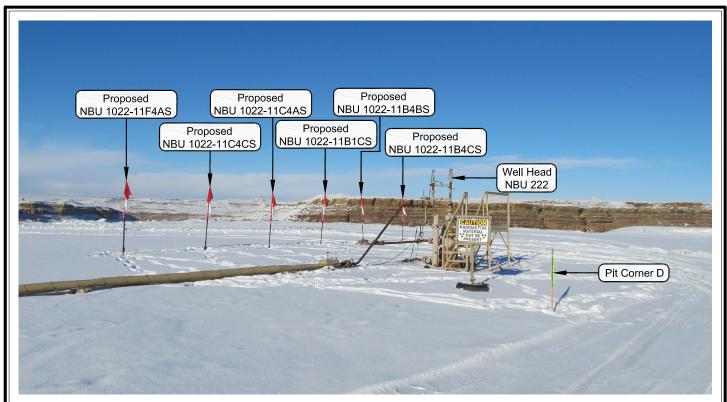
PHOTO VIEW: FROM PIT CORNER D TO LOCATION STAKE
